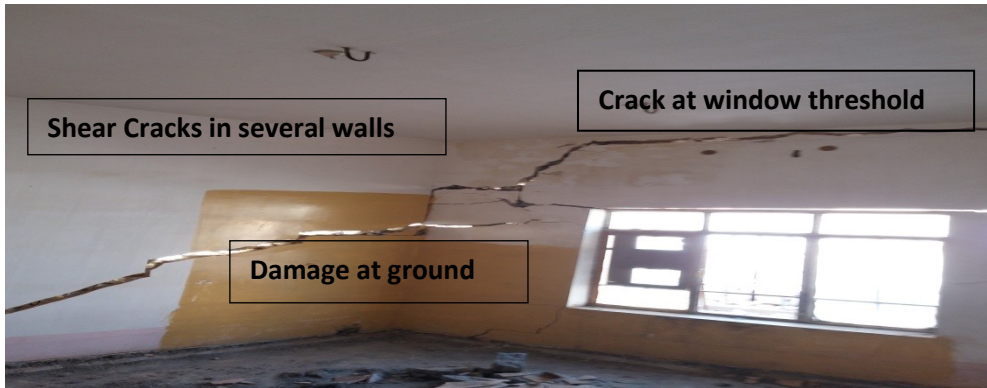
(C) Several Cracks at walls , Window threshold and ground damage
